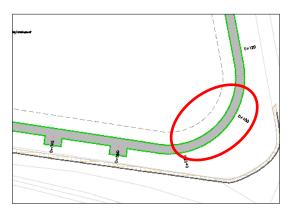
Old Lackanash Road/Newtown Road - Inclined Slope
